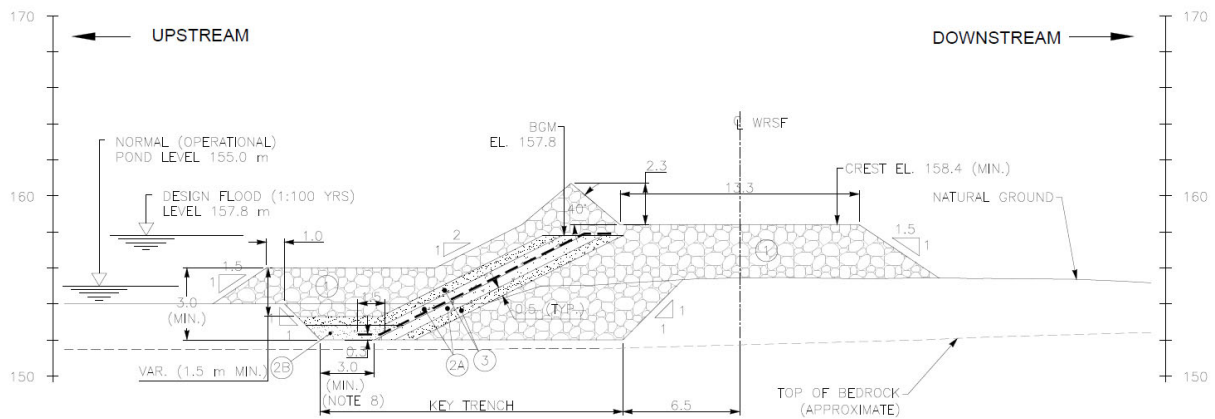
Typical Cross-Sections of WRSF Dike (Without Thermal Berm)
